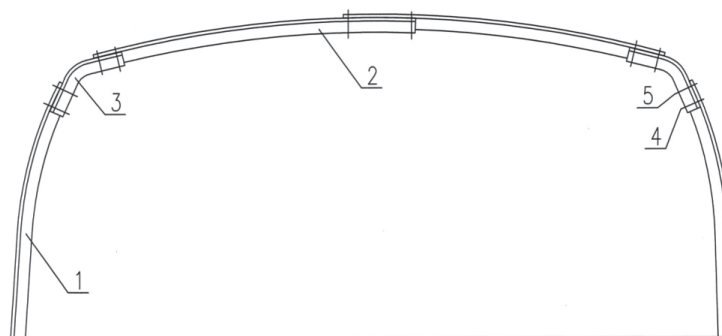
ŁPS frame with a two-element top section: 1 – side section, 2 – top section, 3 – coupling, 4, 5 – shackles
